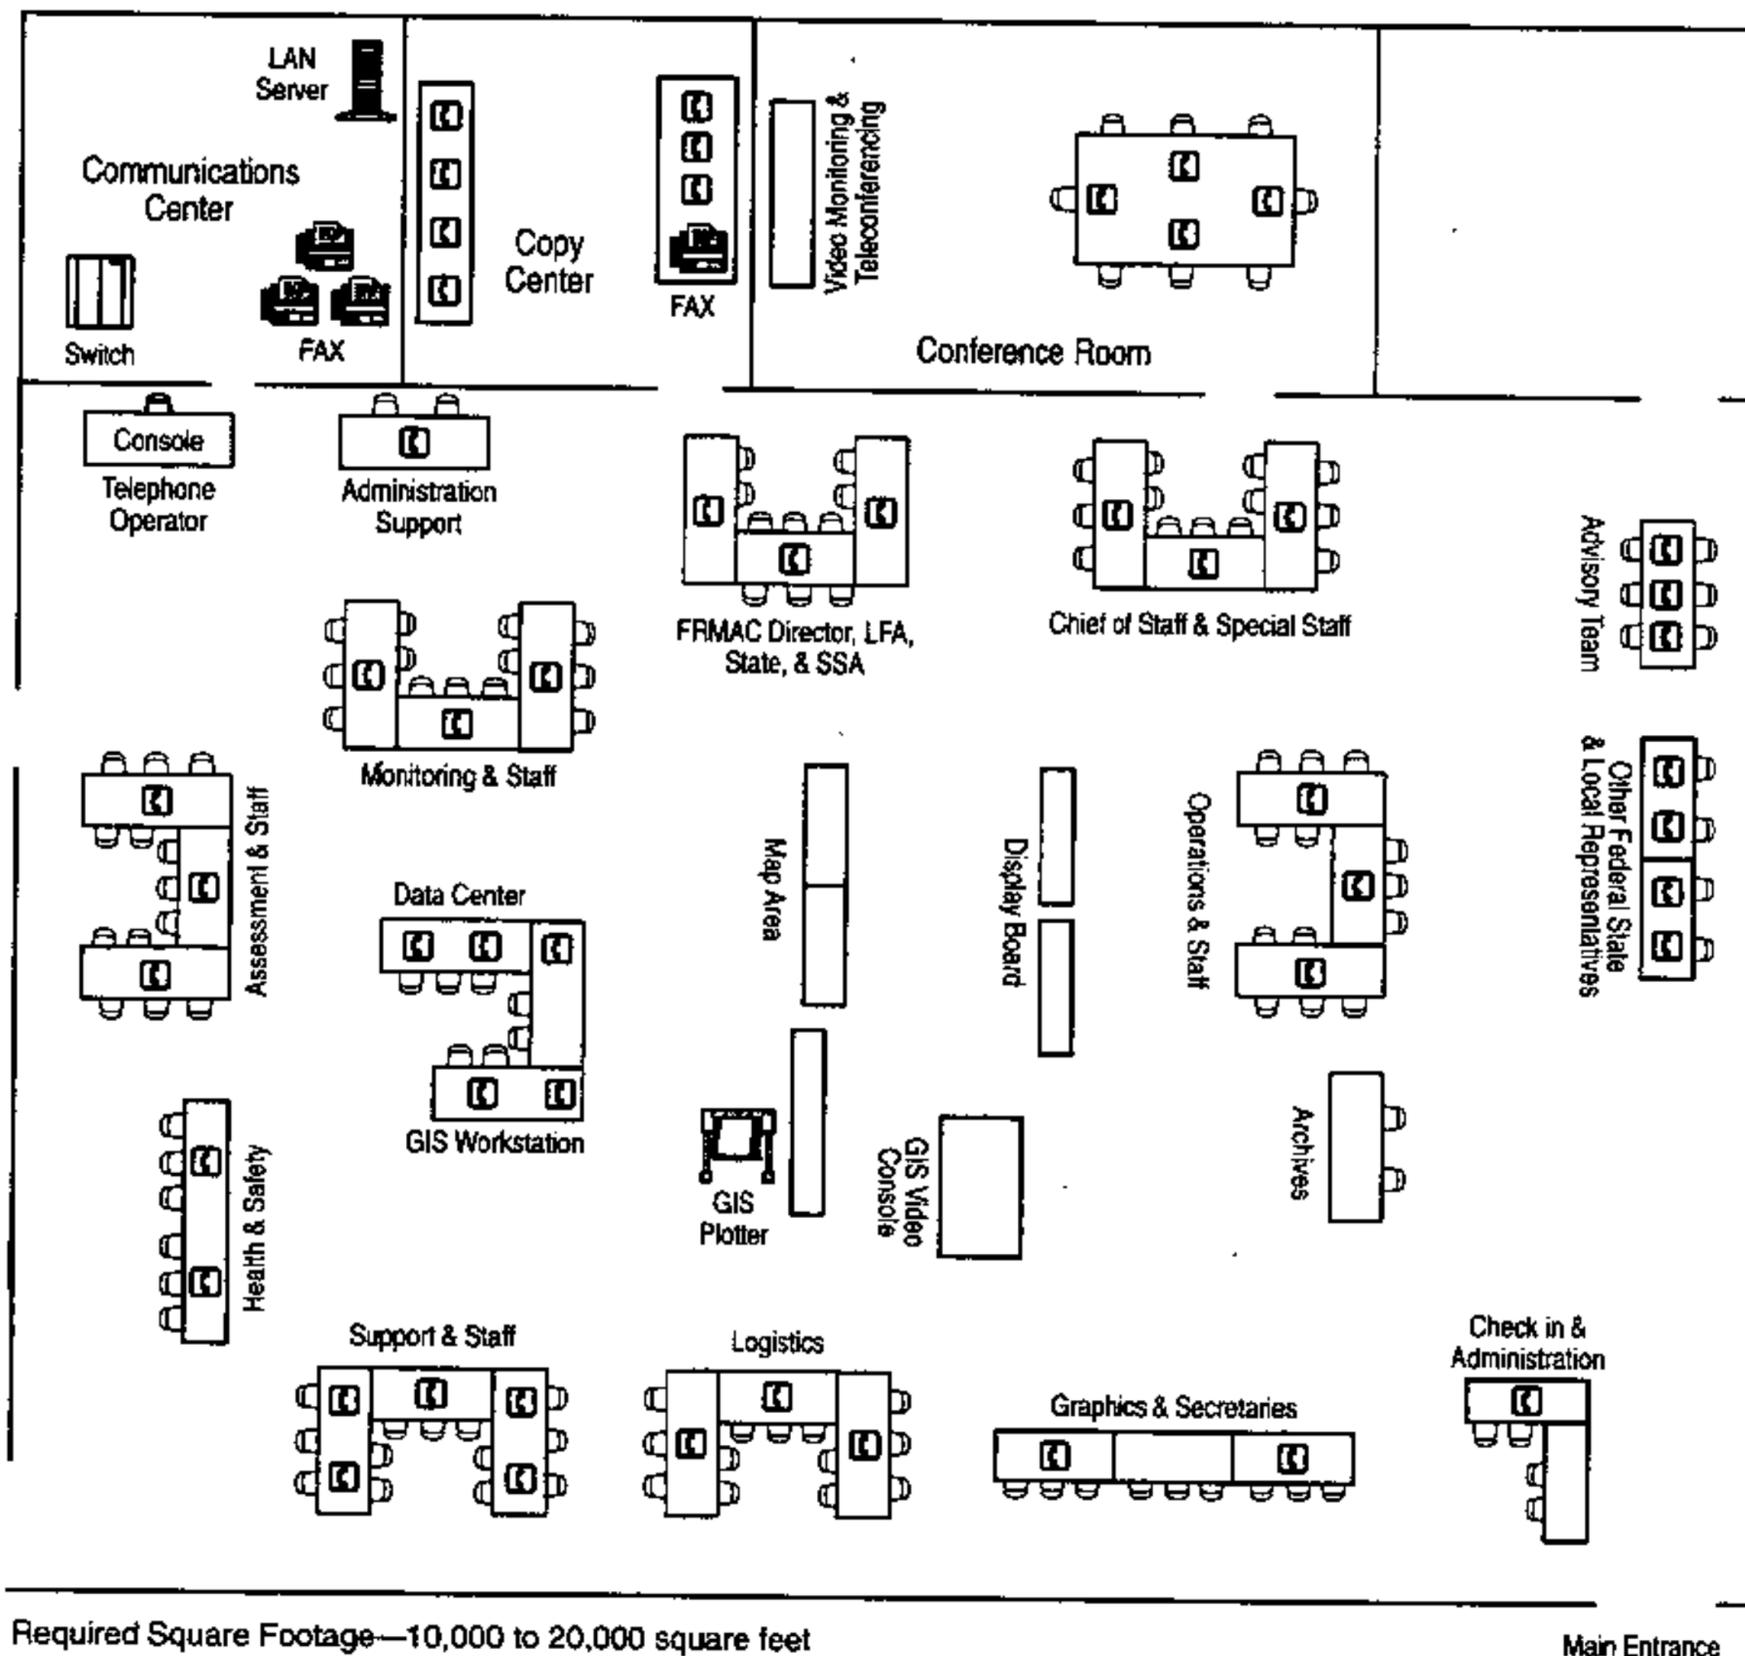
GENERIC FLOOR PLAN FOR THE FRMAC FACILITY
